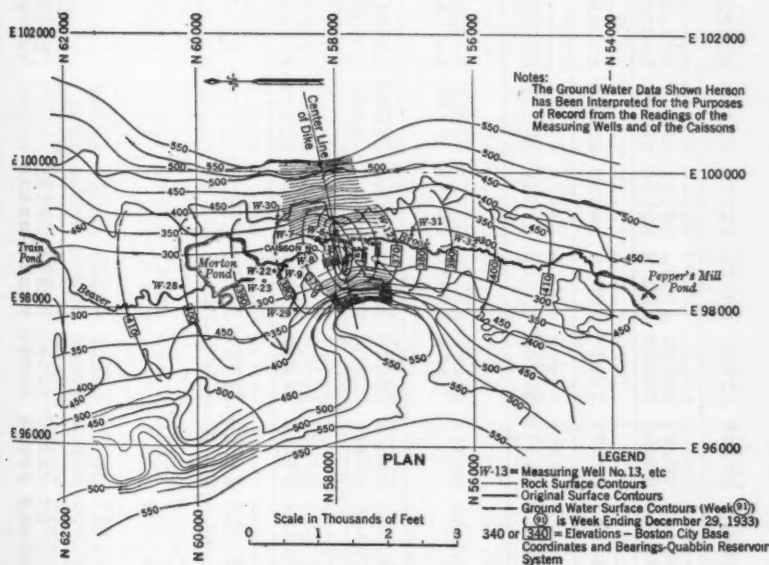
PLAN AT THE SITE OF THE DIKE
